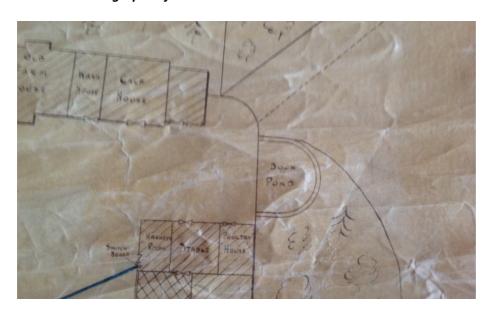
(Above) - A 1920 drawing showing the site layout between cottage no. 1 and Gardner's Cottage. The duck pond was still in place when Mr Ventress first came to the Hall in 1963. We presume the pond was located there to take the surface water runoff and would have been used as an early example of a SUDs type scheme. We assume the idea was to direct the water where it would do no harm without having to install a drainage system.
